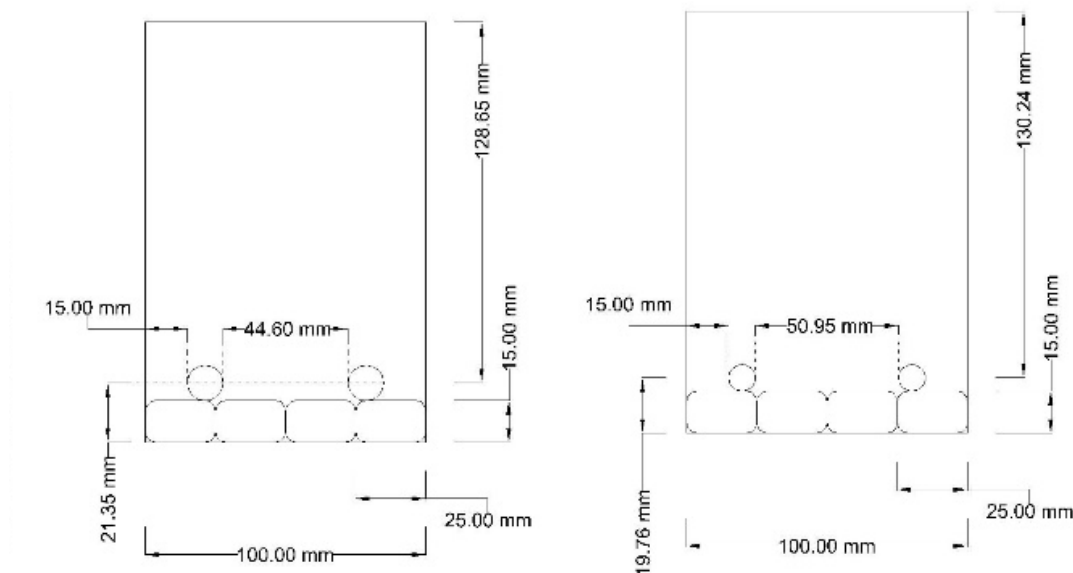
Reference reinforcing configuration for the printed beams with two #4 steel rebars (left) and two #3 FRP rebars (right)
